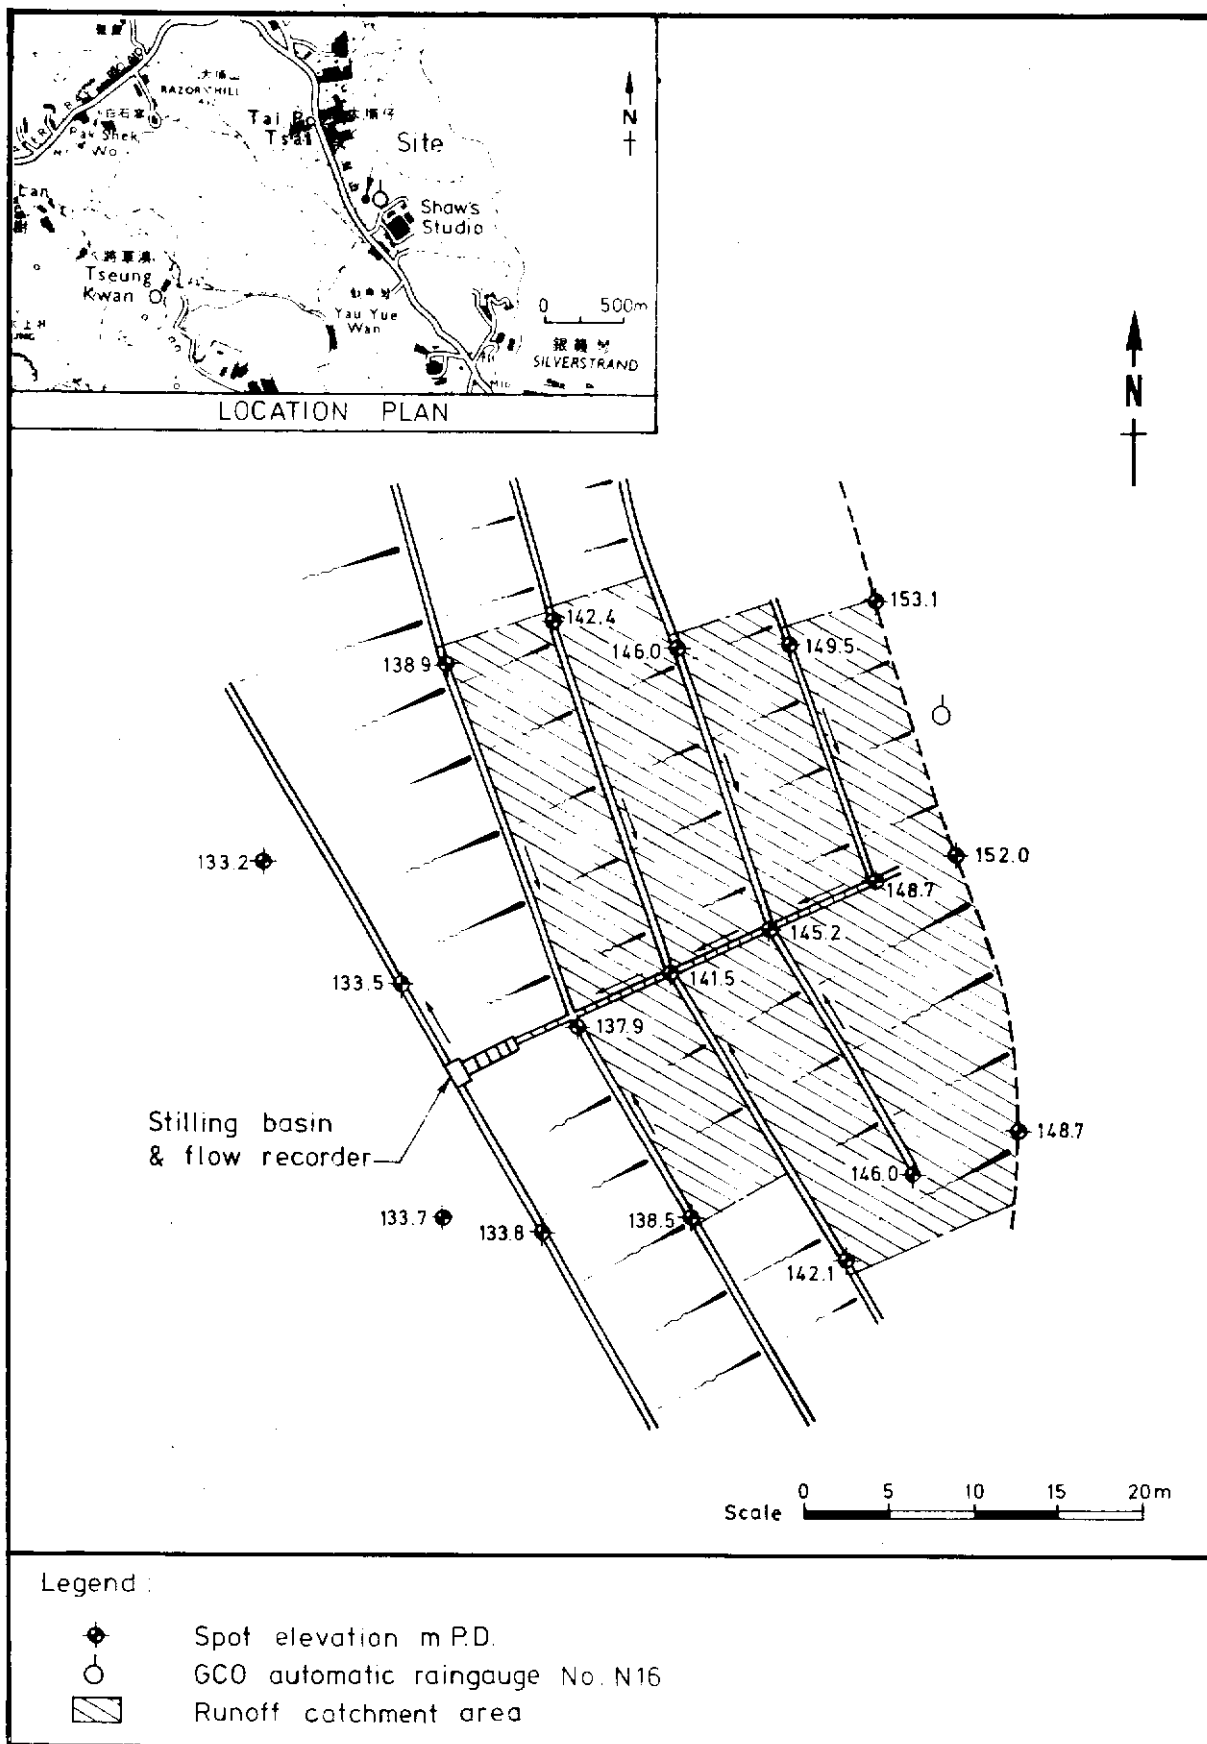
Site Plan for the Runoff Plot at Kohima Barracks (KOH)
